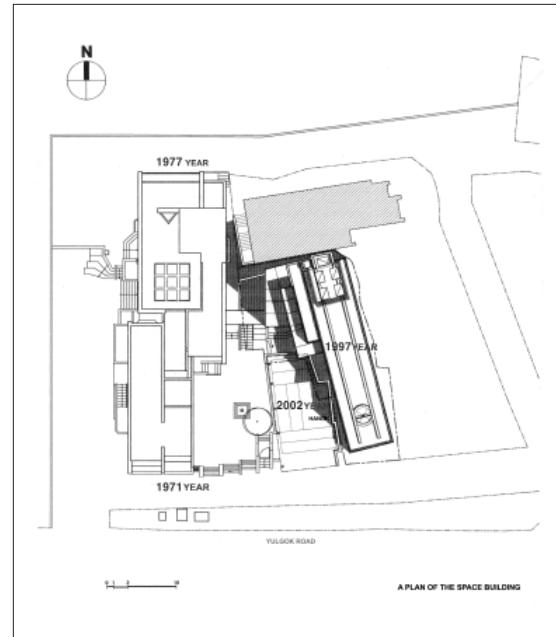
A plan of the SPACE building integrated with traditional Hanok building (source: SPACE group, 2009).
